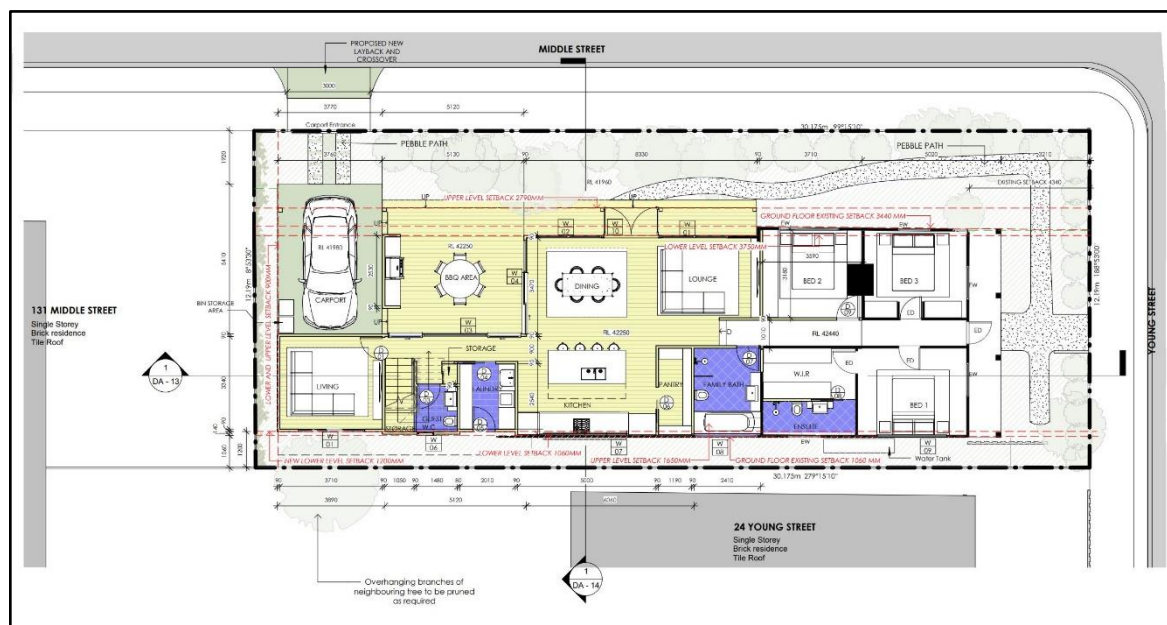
Proposed Ground Floor Plan. (Source: Bentley Design)
